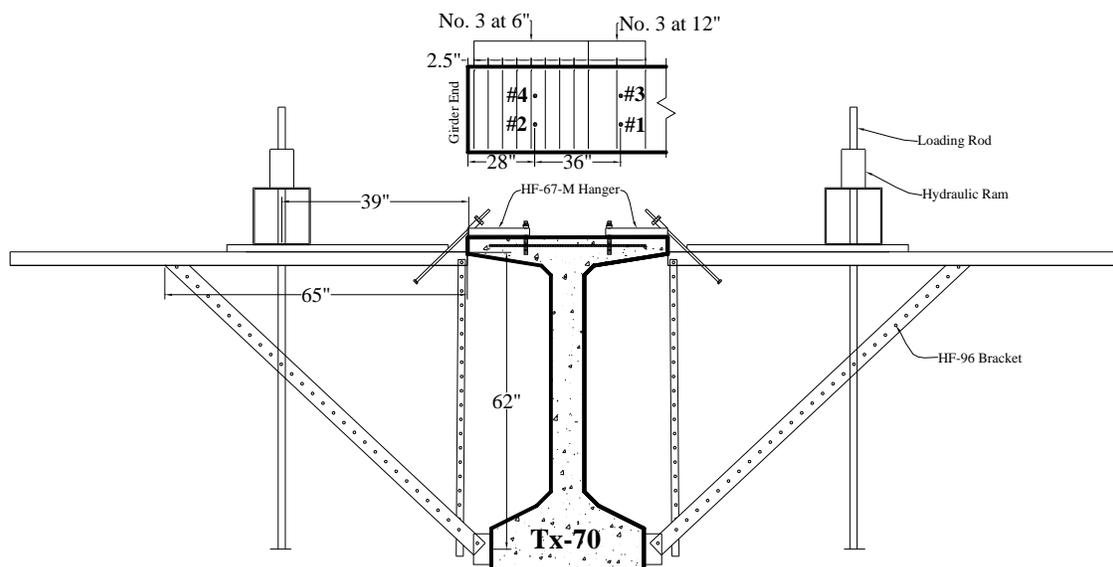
Reinforcement pattern and loading geometry for HF-67-M on Tx-70 Test 1
